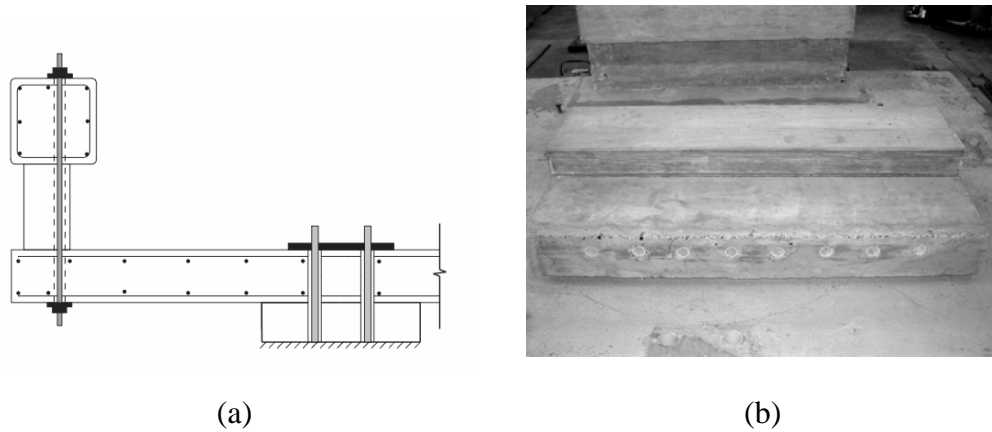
(a)-Schematic of T203 retrofit specimen and (b) T203 retrofit bridge barrier with PVC ducts for anchors
